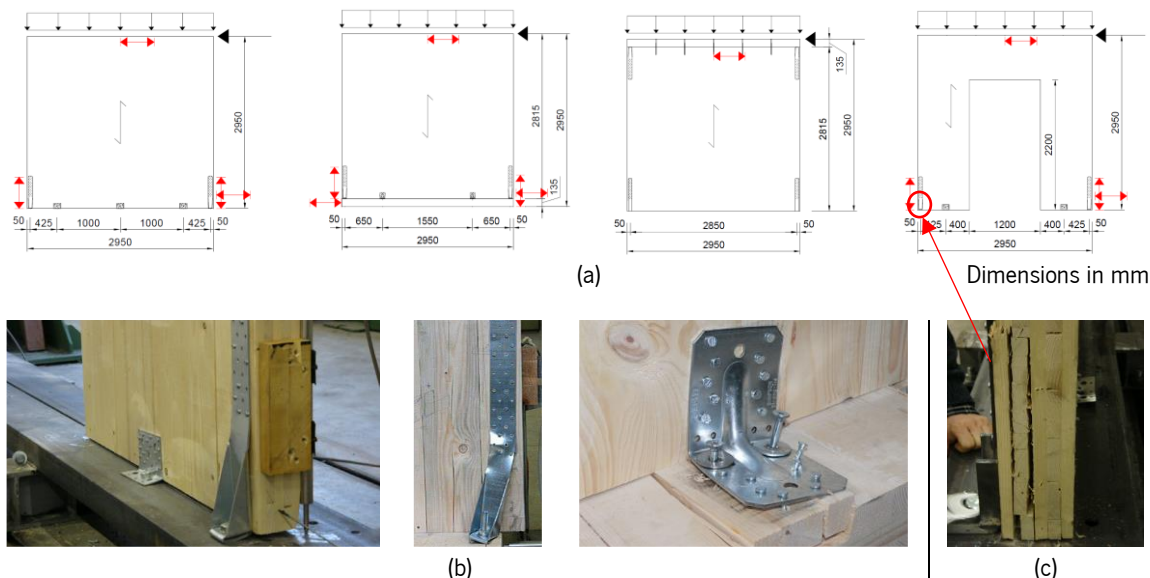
Wall Configurations (a) and failure modes of the walls tested (b and c) [30].
